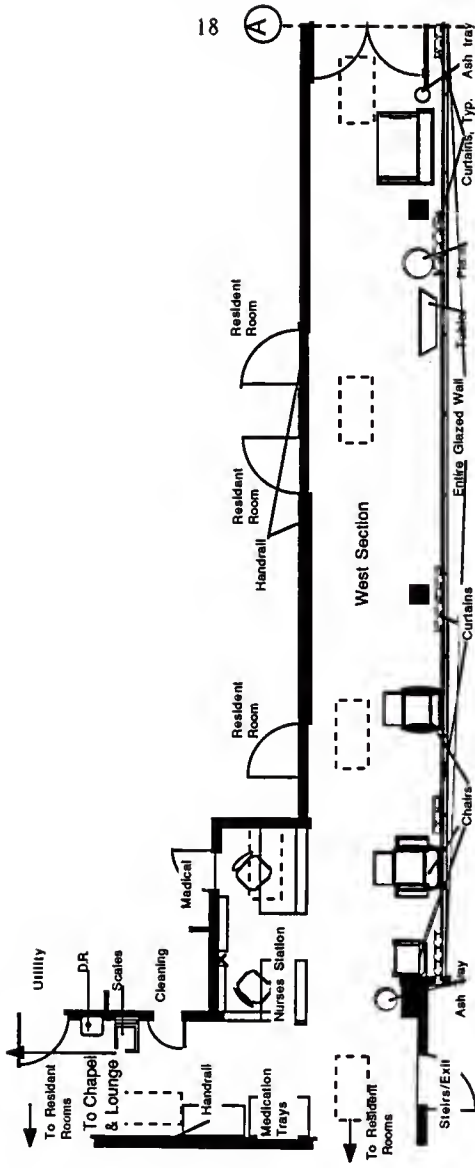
The Main Corridor Plan (Shown was the west section. Scale: 1/8" = 1' 0" North Δ).
